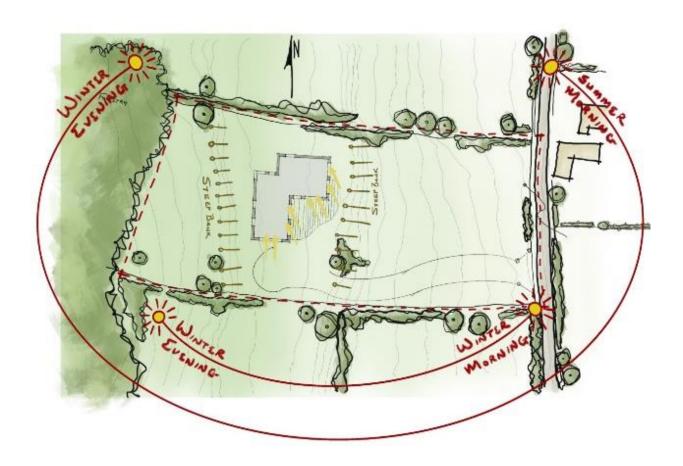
Careful and informed site planning and house orientation to benefit from solar gain.
